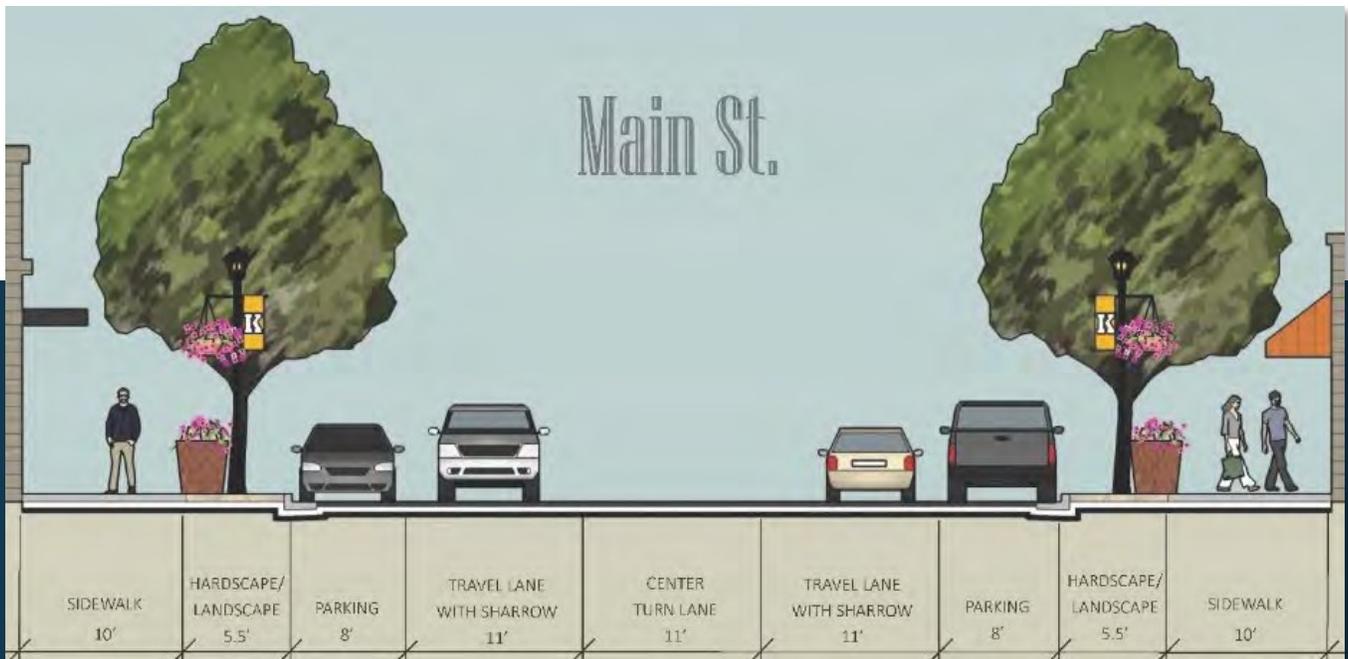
Kuna Main Street Typical Section – larger version can be found in Appendix A
